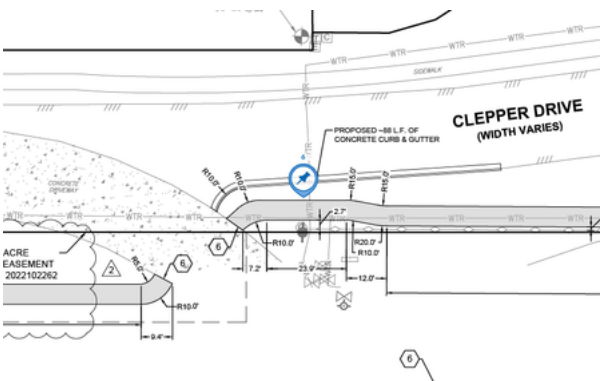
PAVING & DIMENSION PLAN Rev.0
